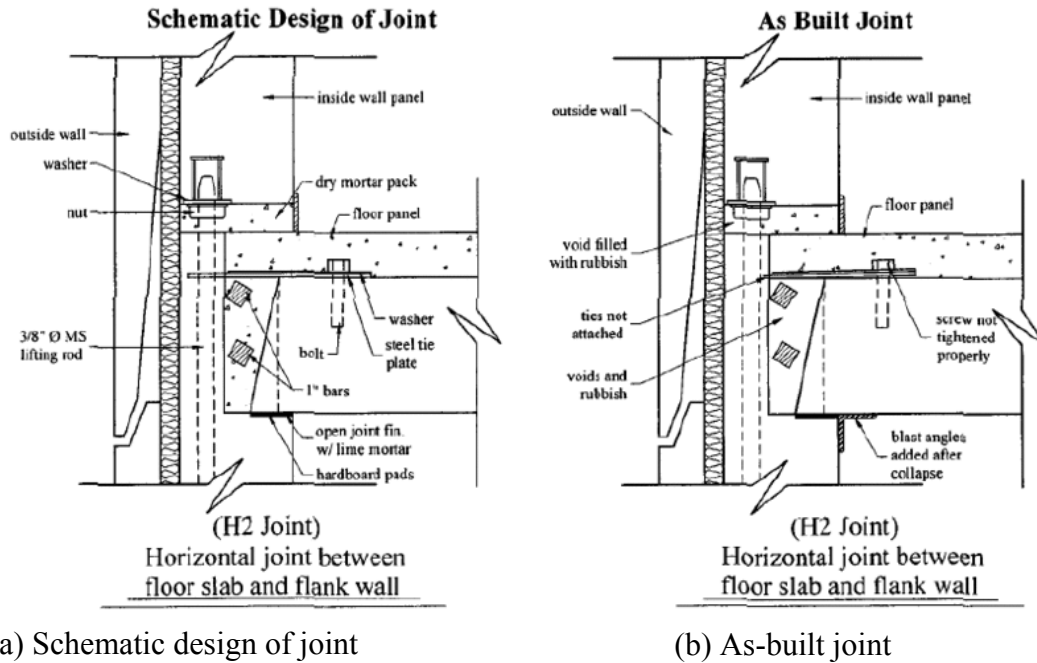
Side view of Ronan Point Apartments design of joint (Figueroa, 2014)
